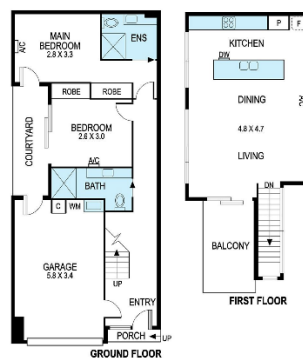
Floor plan of the dwelling known as No. 53 Botherambo Street
